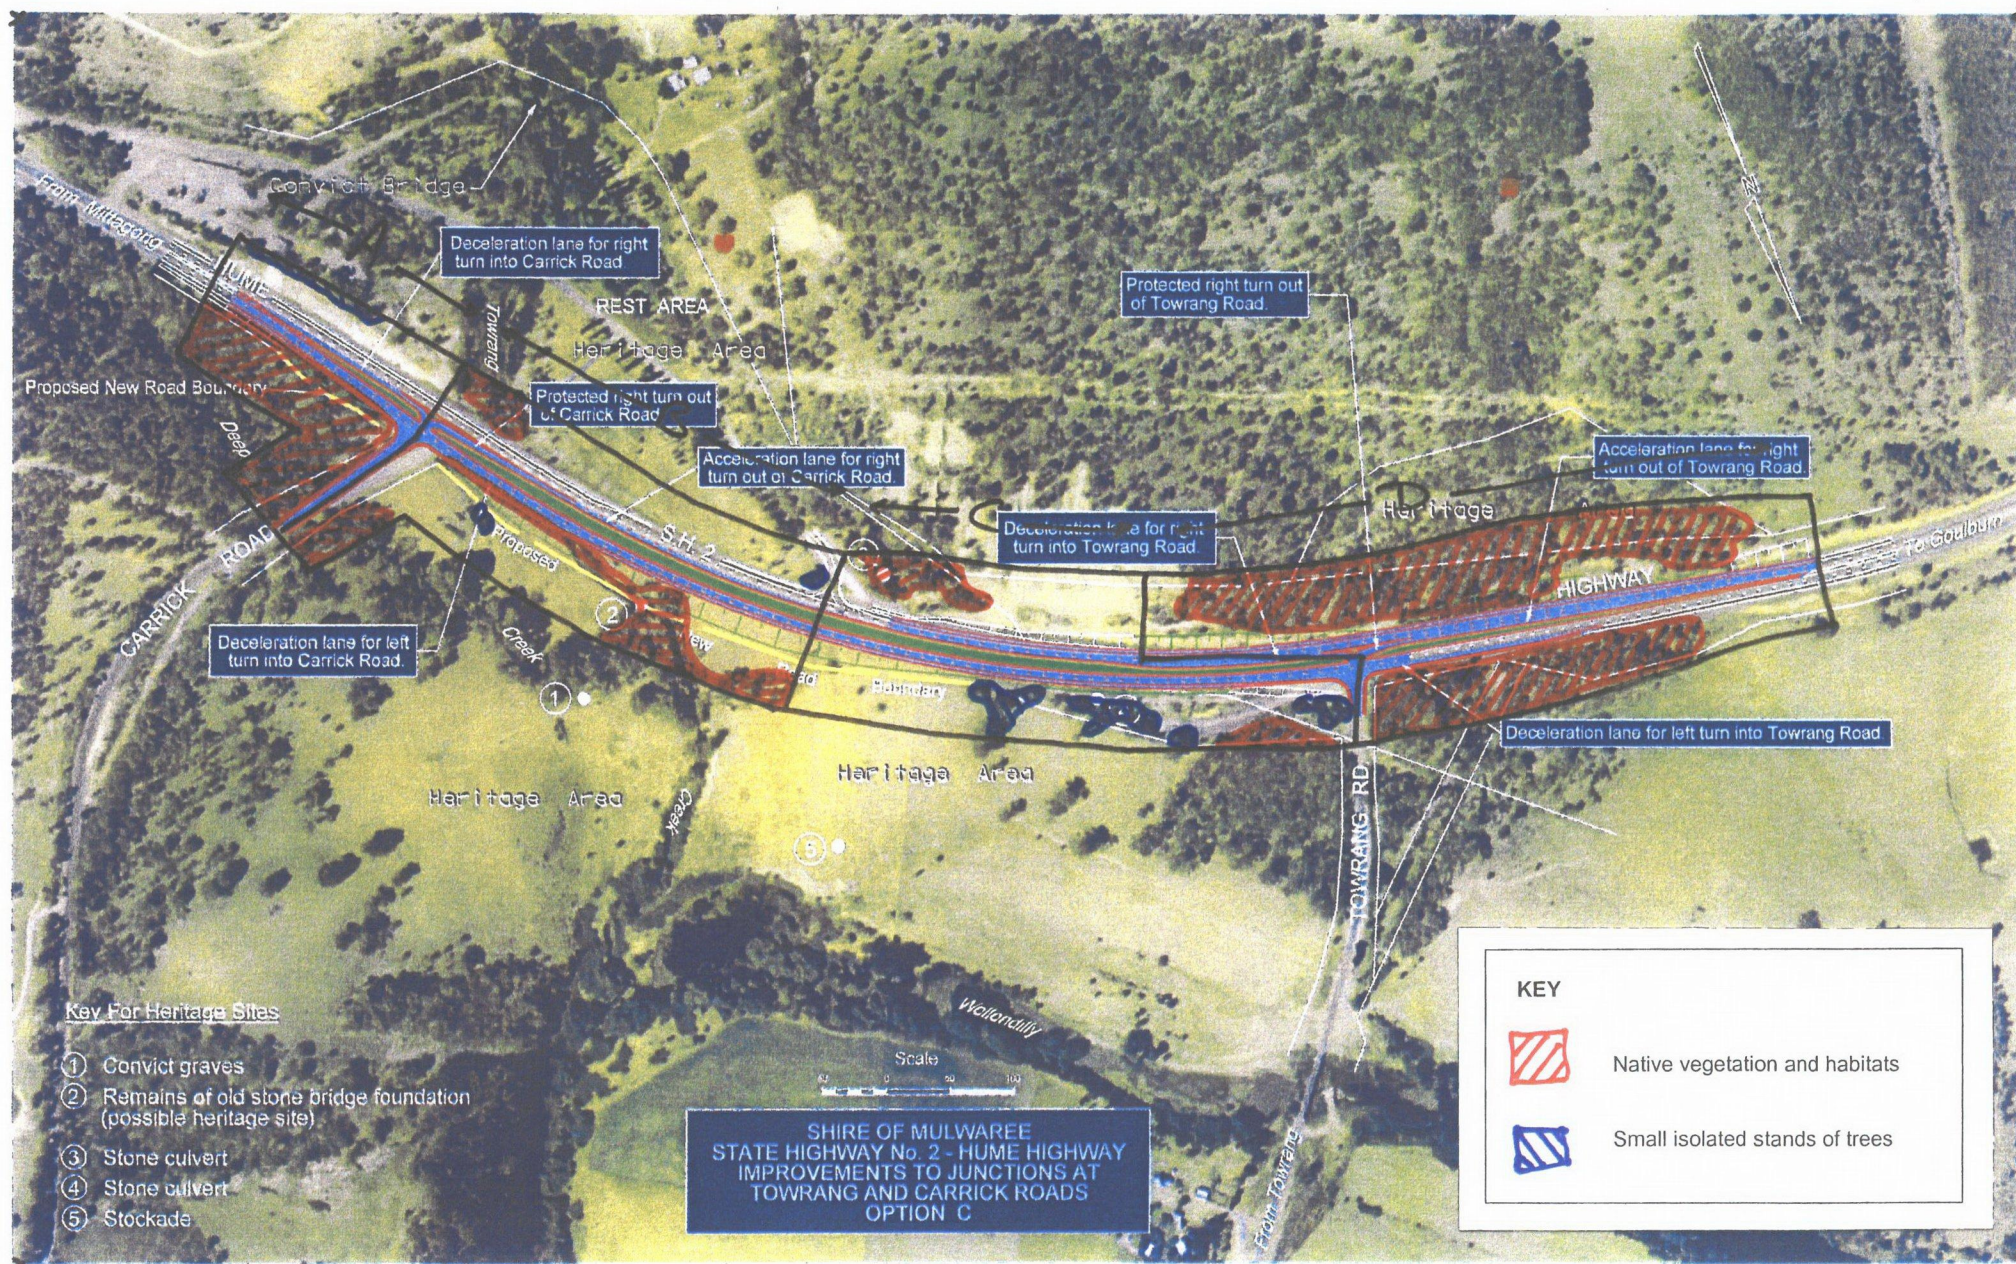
Aerial photo of the study area illustrating the 4 sections of the study area, and existing vegetation/habitats.
